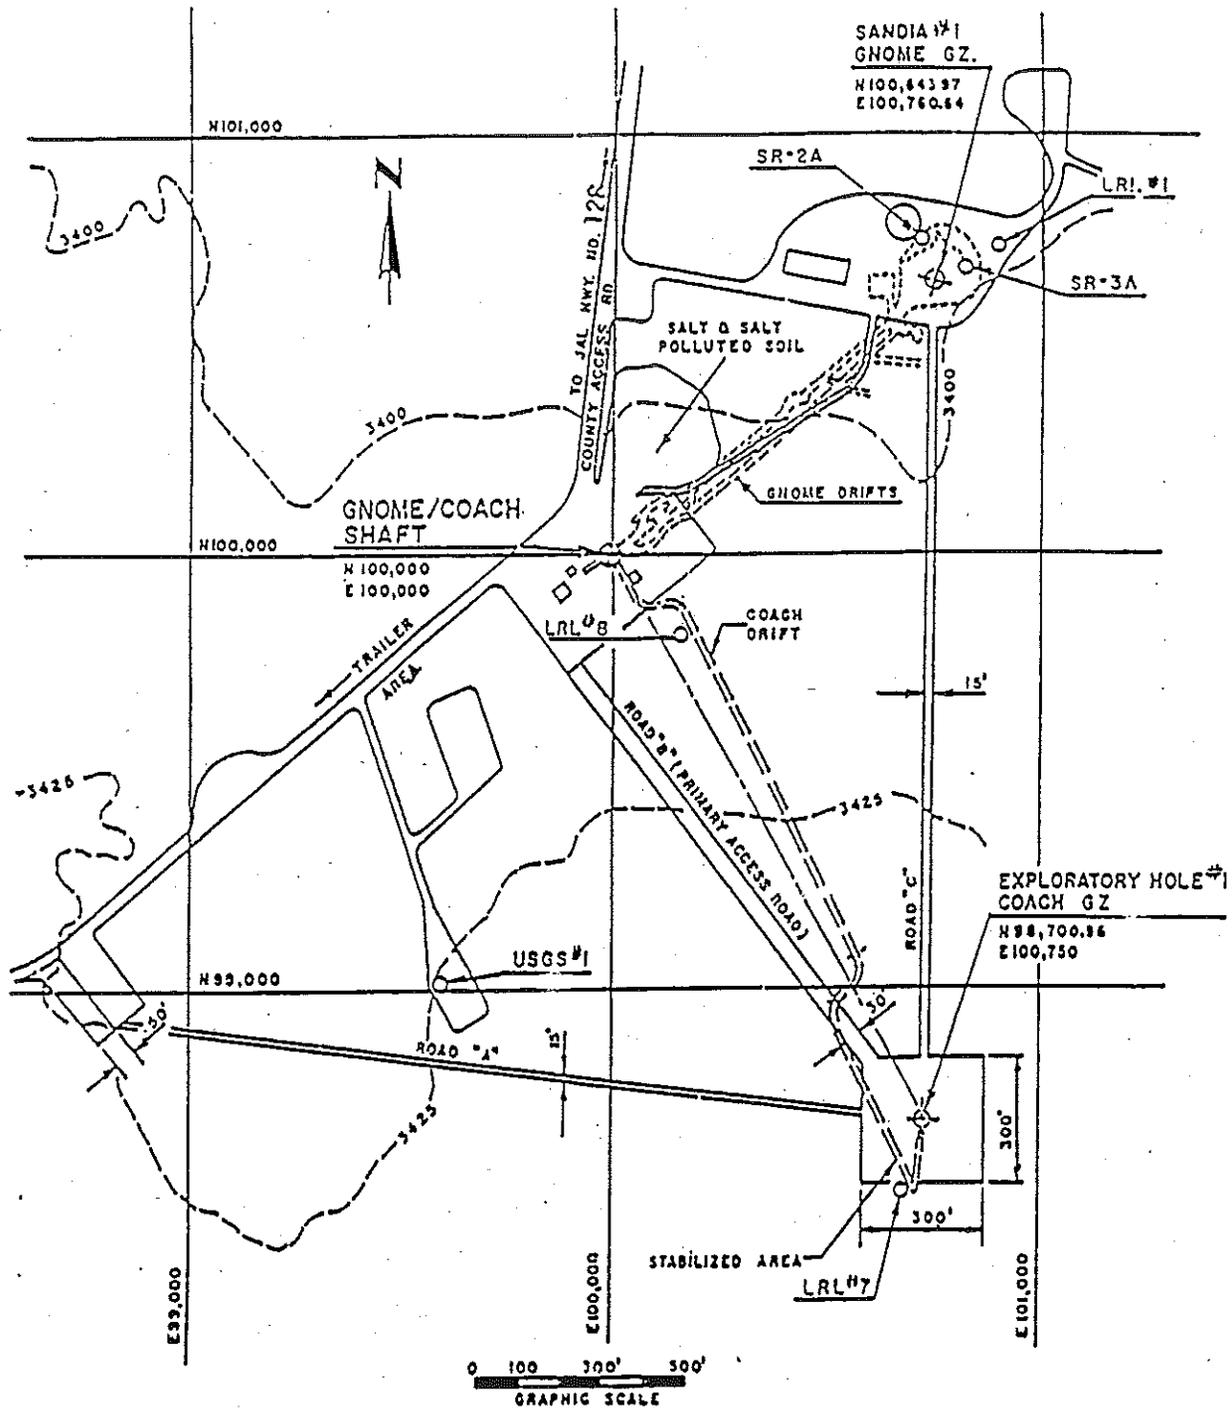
Project Gnome-Coach Site Plan (from DOE, 1979).
